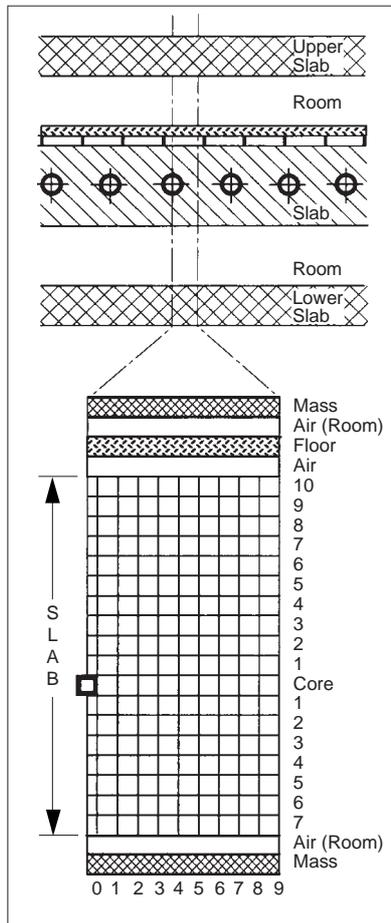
Schematic section through concrete core (top) and illustration of the finite element model (bottom)
